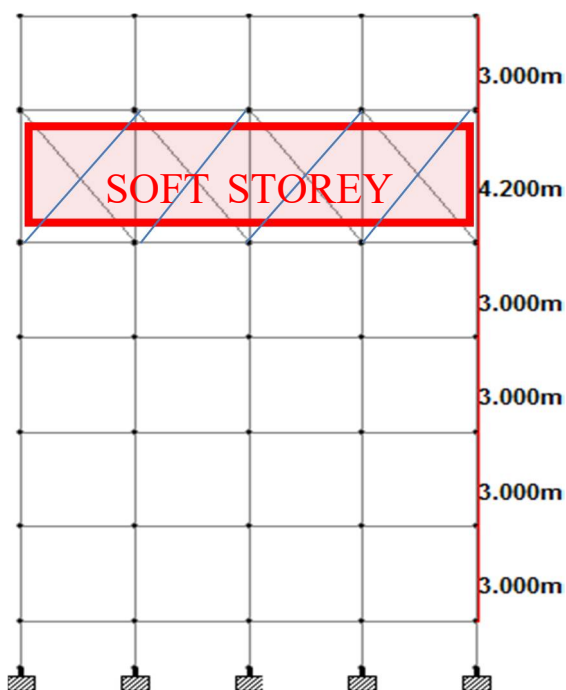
9 Fourth Floor Soft Storey With Inclned Column (CASE VII)
